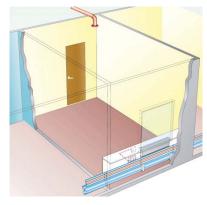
An induction unit for cooling, heating and ventilation placed next to an external wall in an office module.
